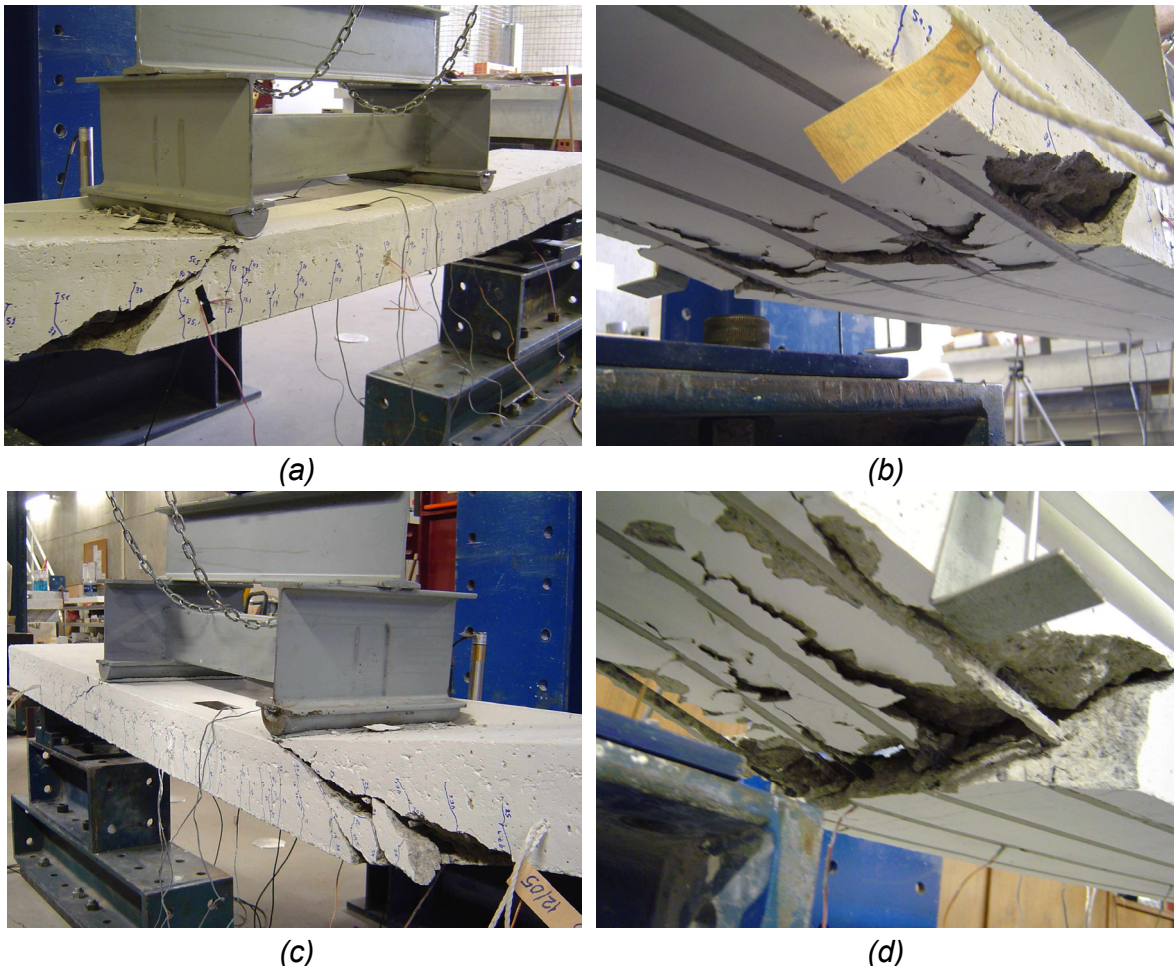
Failure mode of the slab strengthened with NSM: (a) lateral view of cracking pattern and concrete crushing at the top and (b) lateral and bottom view of shear crack in slab SL3S; (c) and (d) lateral views of concrete crushing in compression of slab SL4S.
